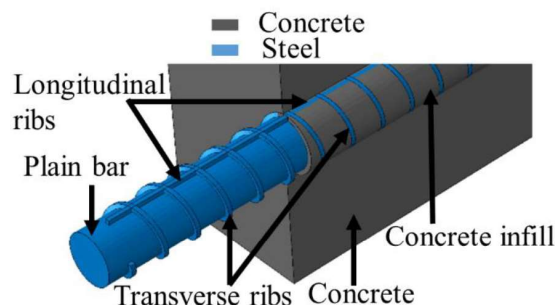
Sliced section of numerical model representing ribbed rebar, concrete infill and beam
